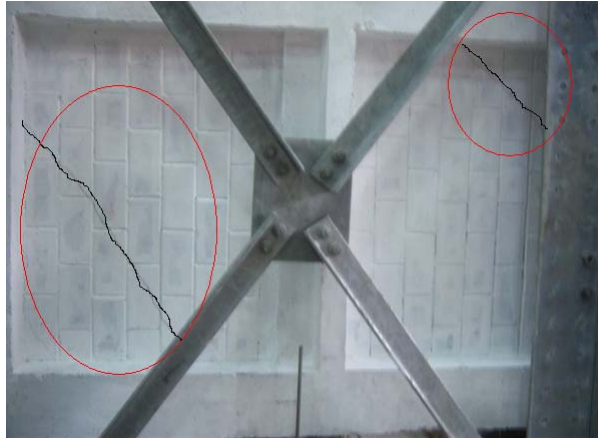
Cracks on the First and Second Story Infill Walls of the Right Frame
